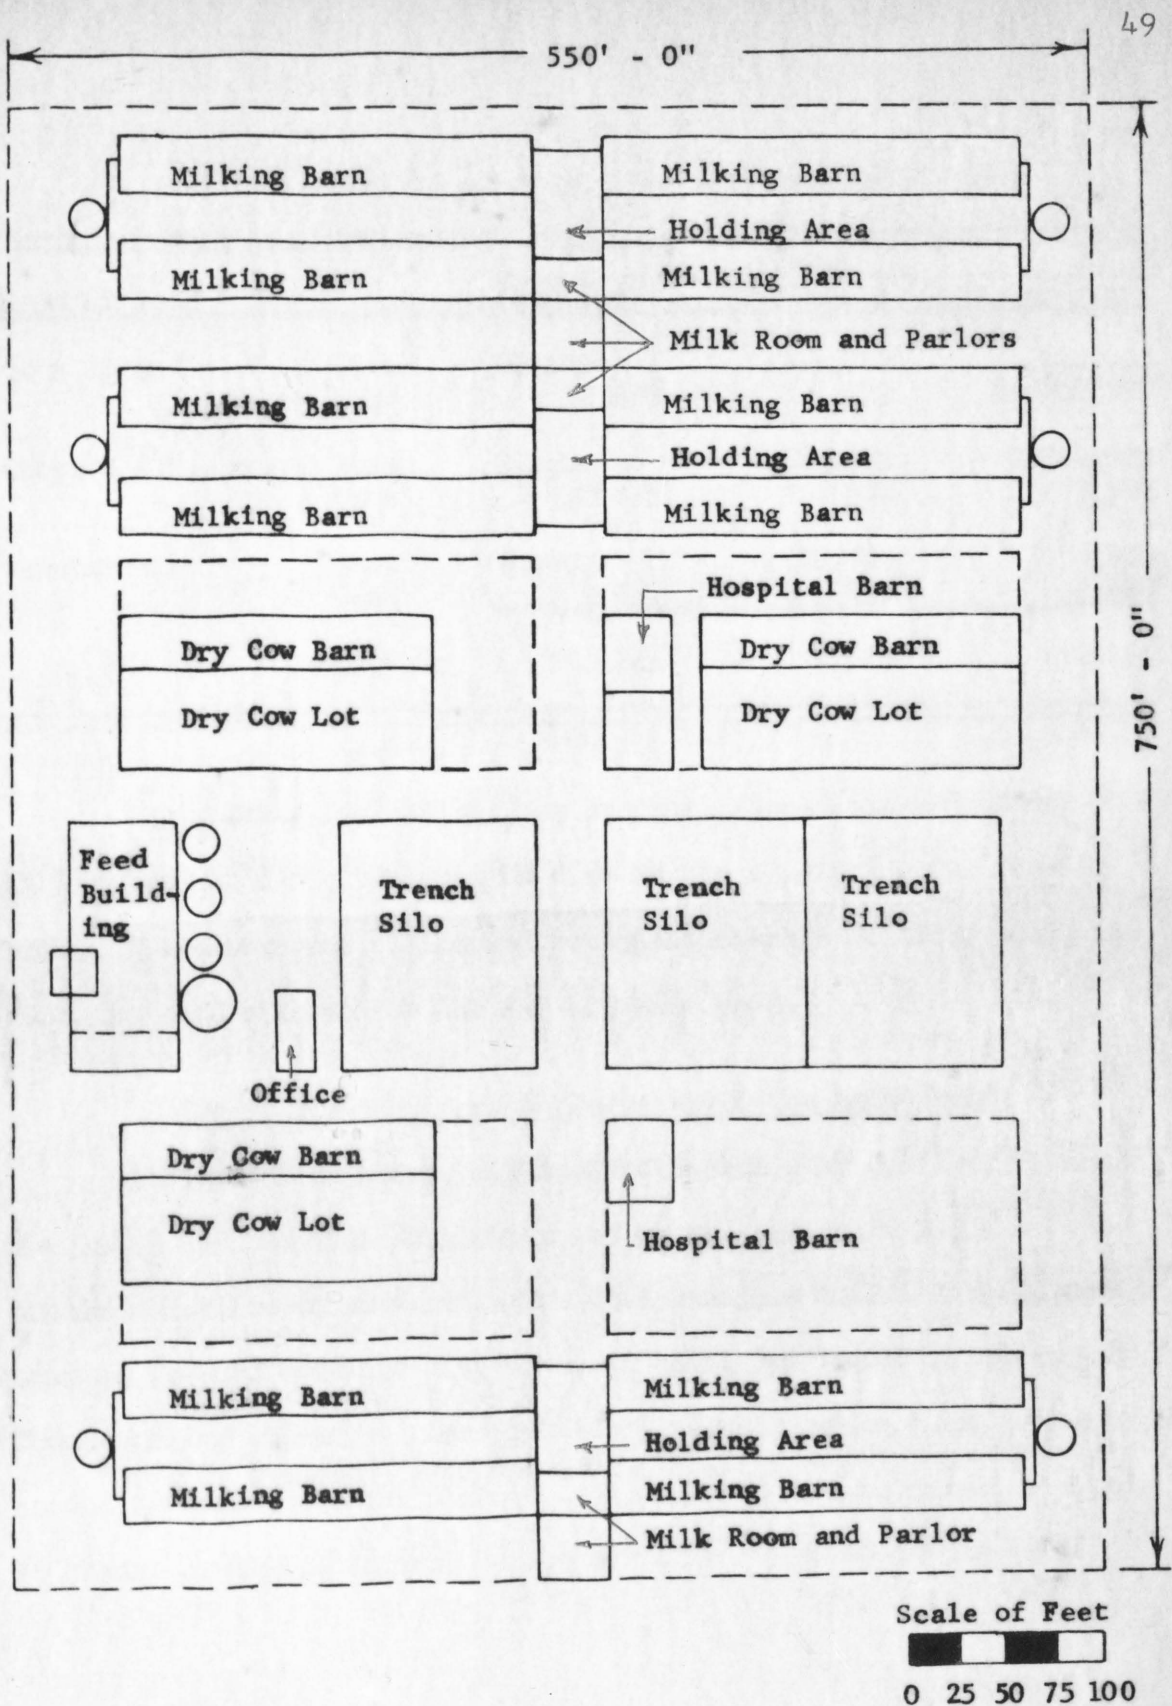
Figure III. Proposed Layout For 1,440 Cow Dairy Herd - Stanchion Barns
